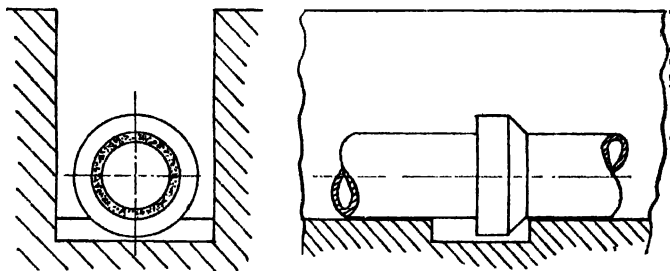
HOLE IN GROUND FOR SOCKET JOINT MAKING
